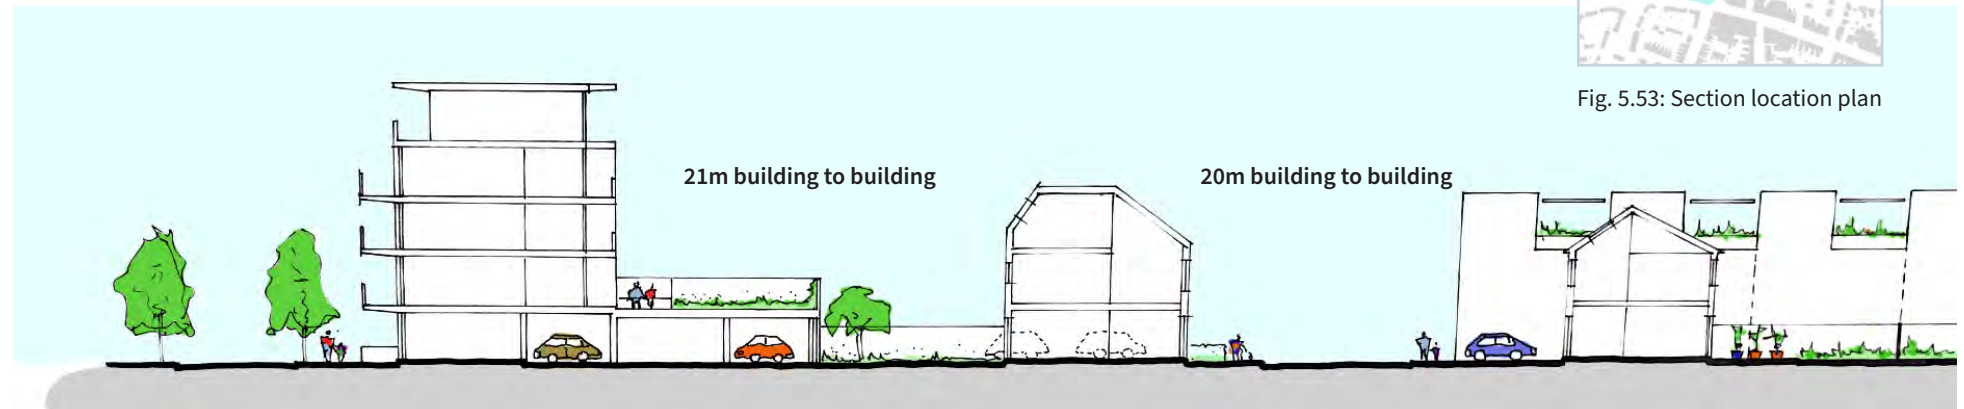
Illustrative section showing decreasing density from Grove Street towards Moilliett Street Park
